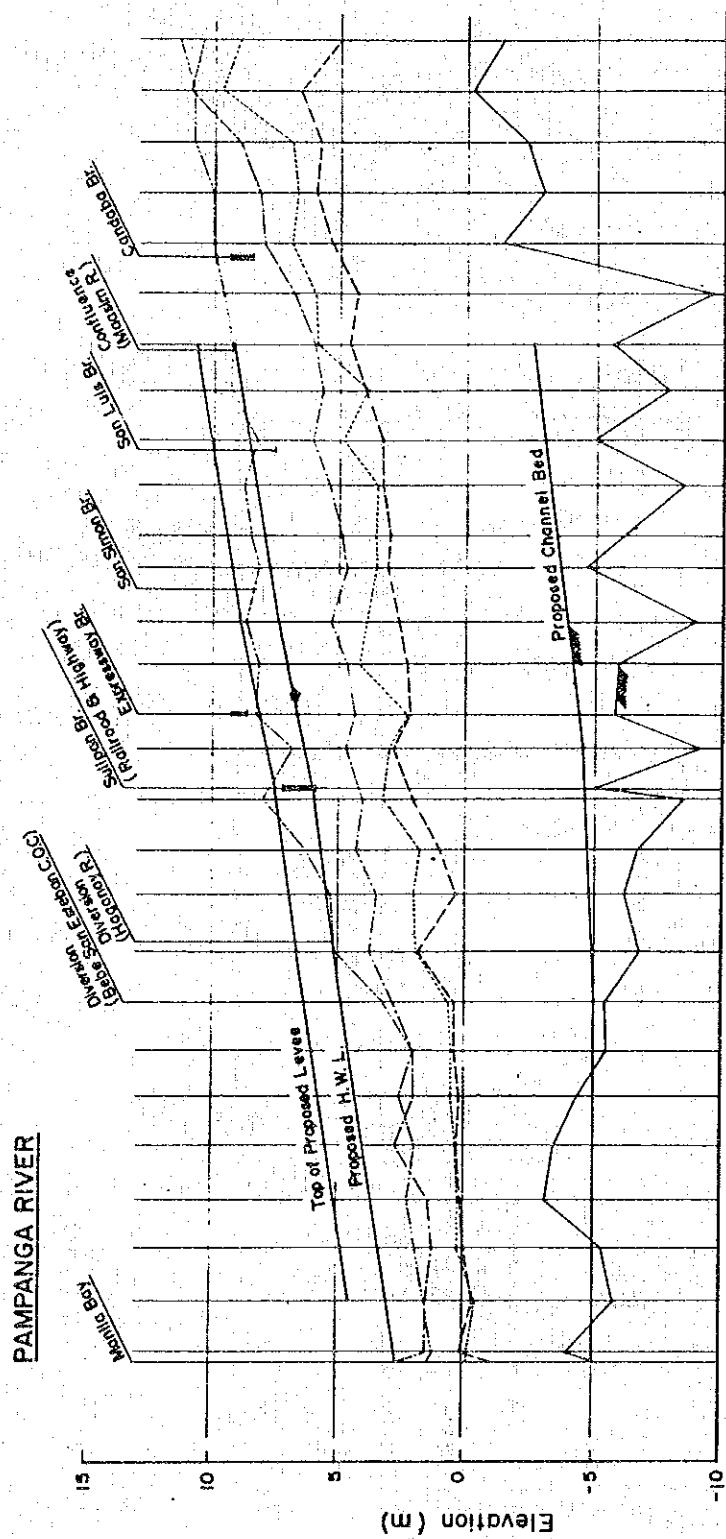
(1) PROPOSED LONGITUDINAL PROFILE FOR BASIC PLAN
